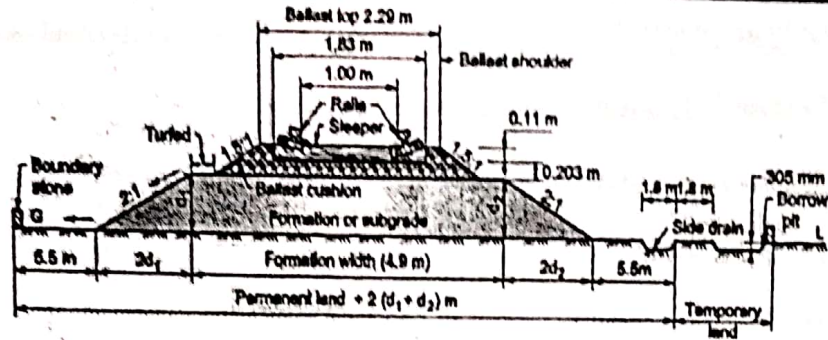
Cross-section of a single meter gauge track in embankment
